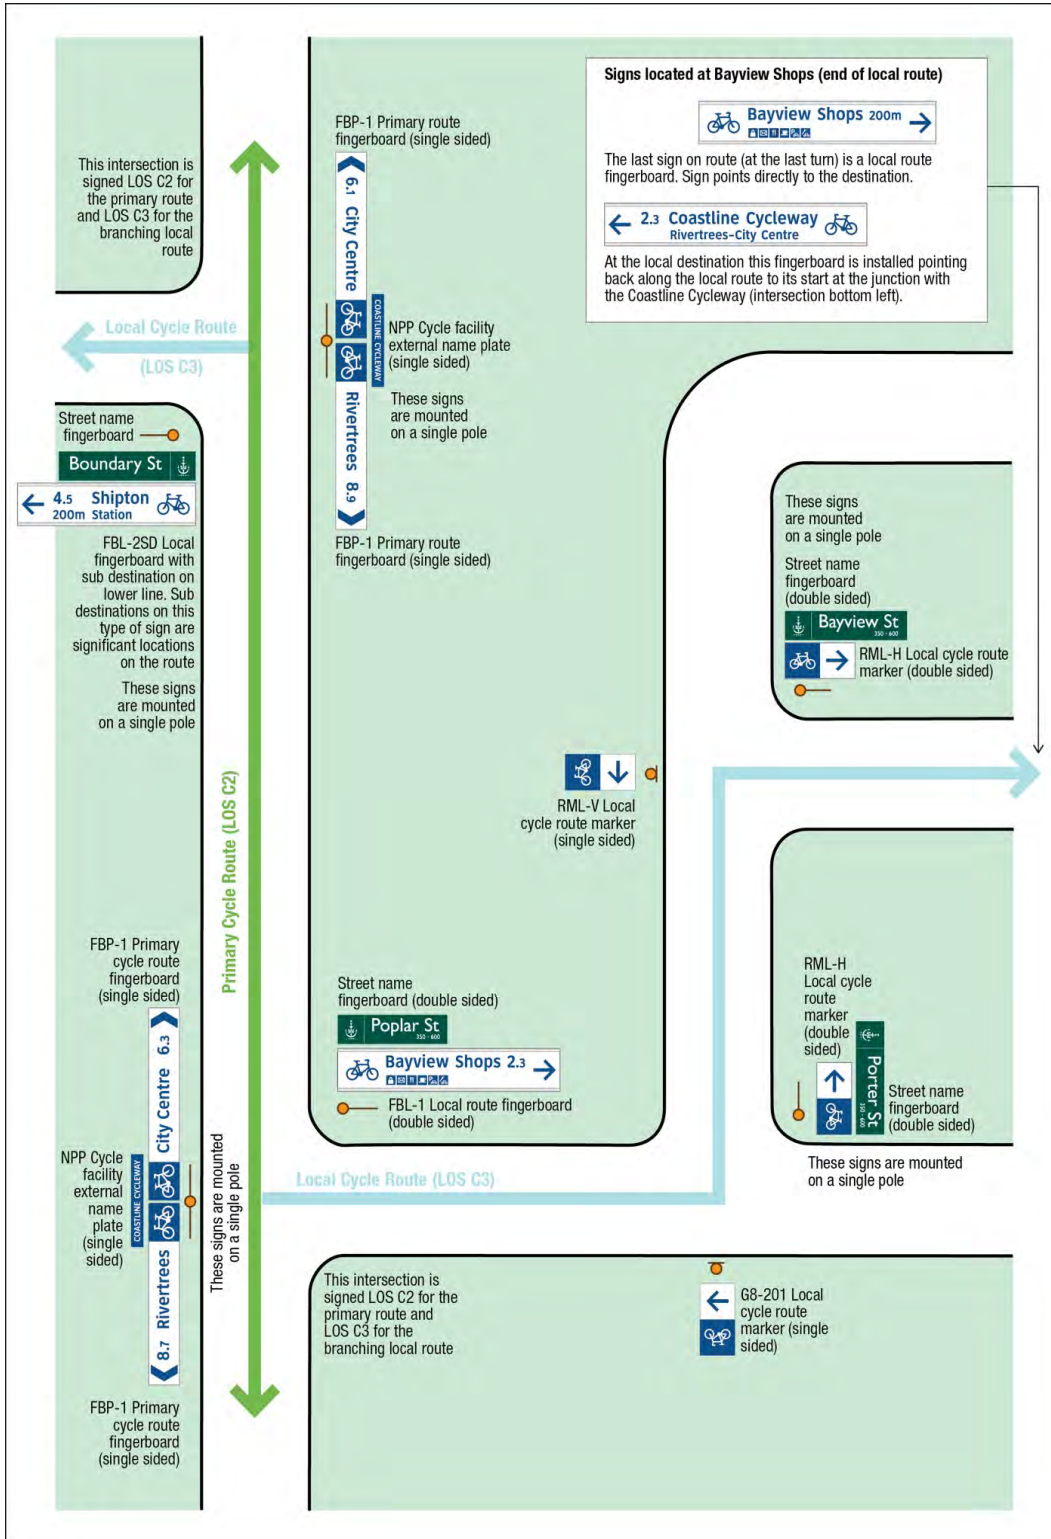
Typical intersection sign placement layout for secondary recreation bicycle route.
